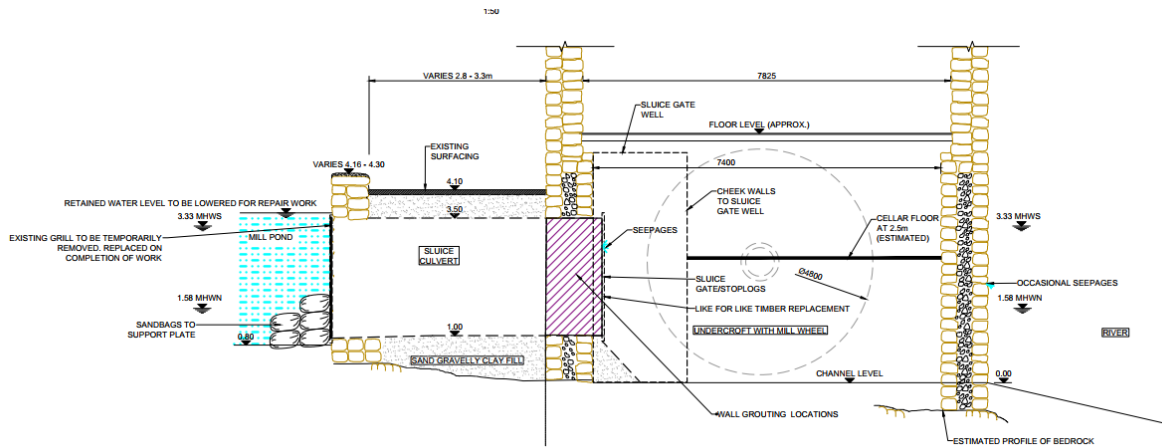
Grouting repairs within the Mill House (Drawing 5129589.016-ATK-ZZ-ZZ-DR-D-0002-P06)
